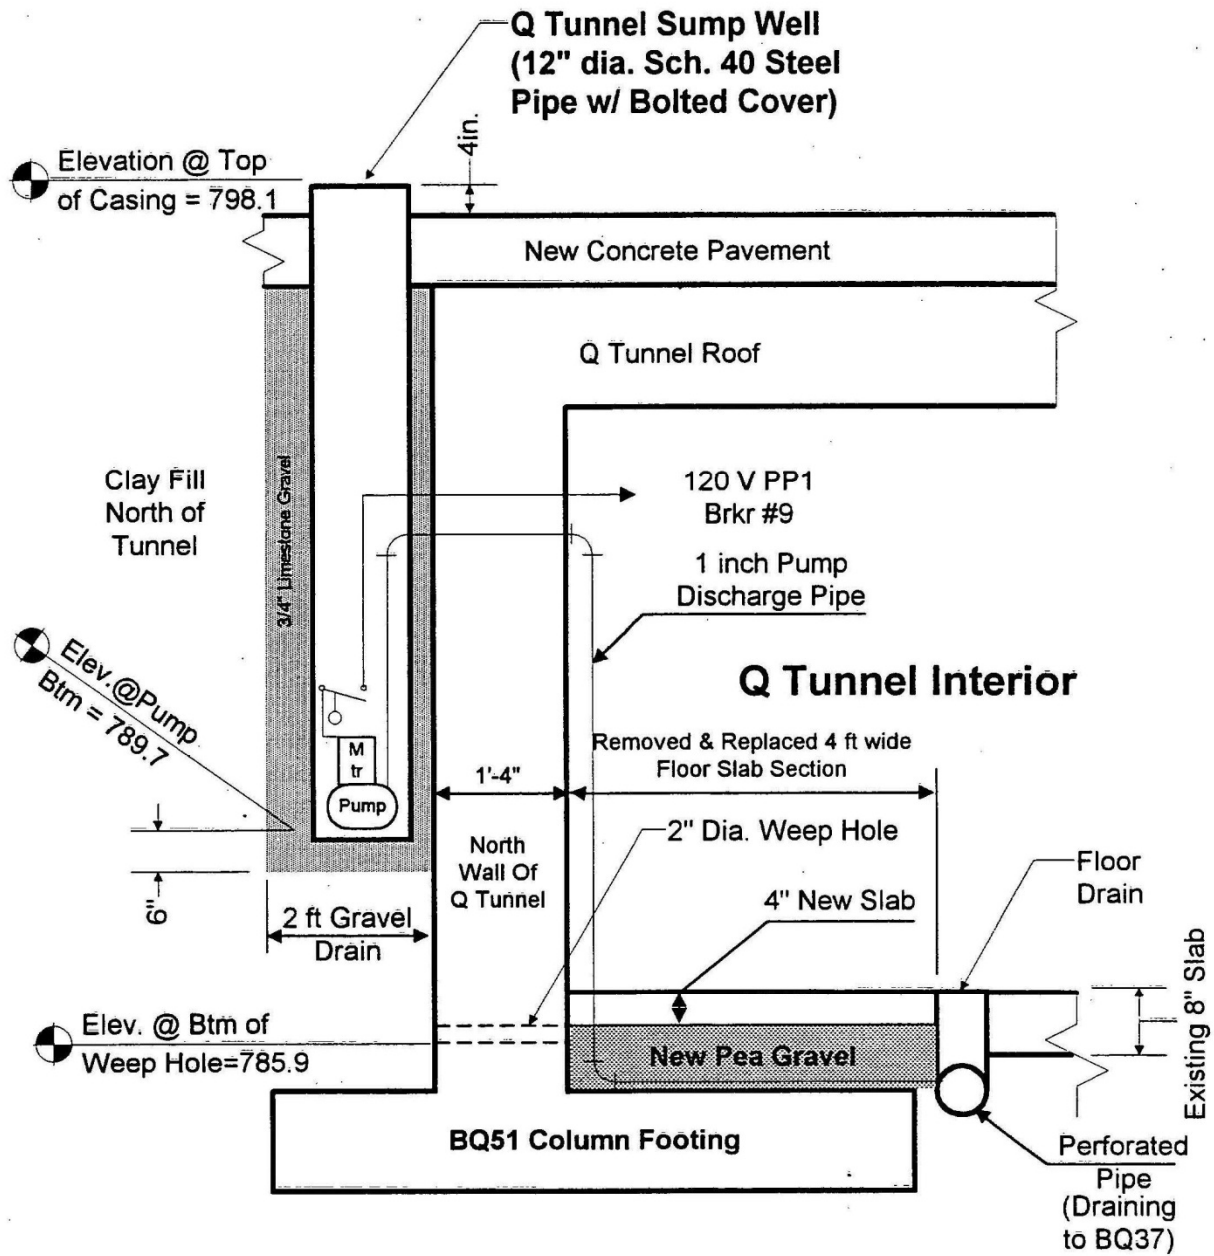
Figure QSWE--Q Tunnel Sump Well Elevation Detail
